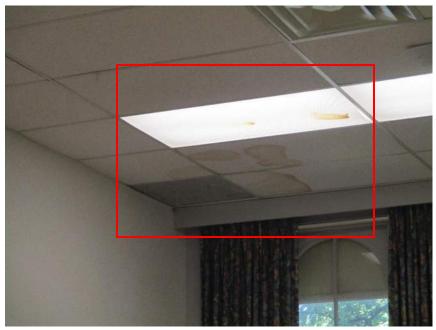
View of typical stained ceiling tiles in the main hall reportedly related to roof leaks (west addition).
